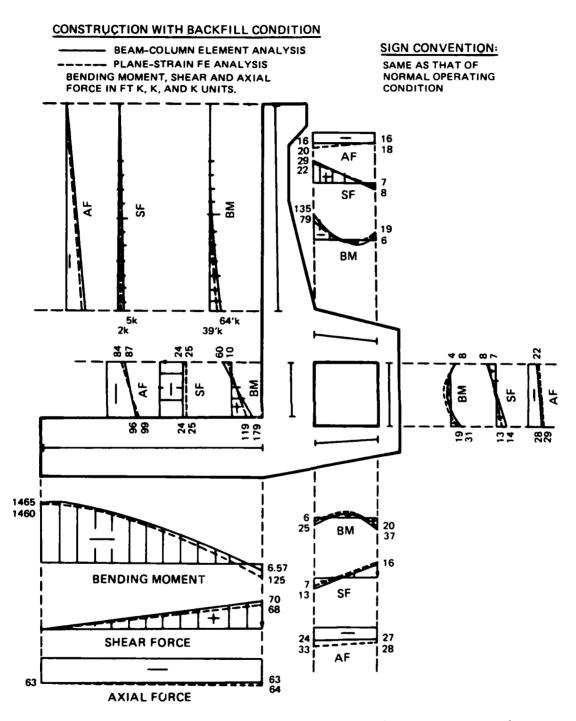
Case 1B--internal forces acting on construction with backfill condition
